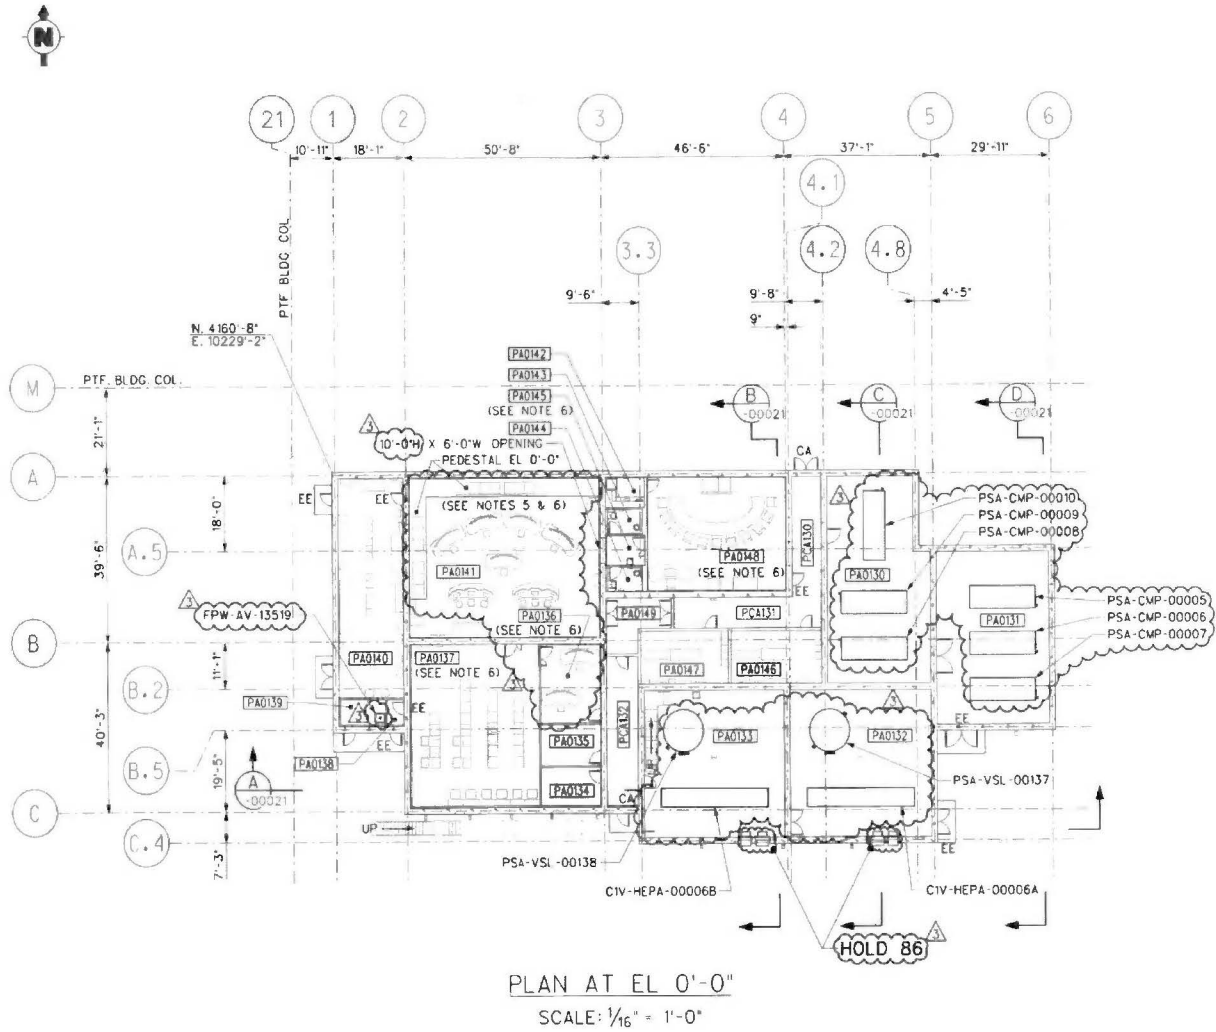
Pretreatment Facility Annex Plan View Showing Location of Safety Air Compressors and Receivers (Column Lines 3-6).
